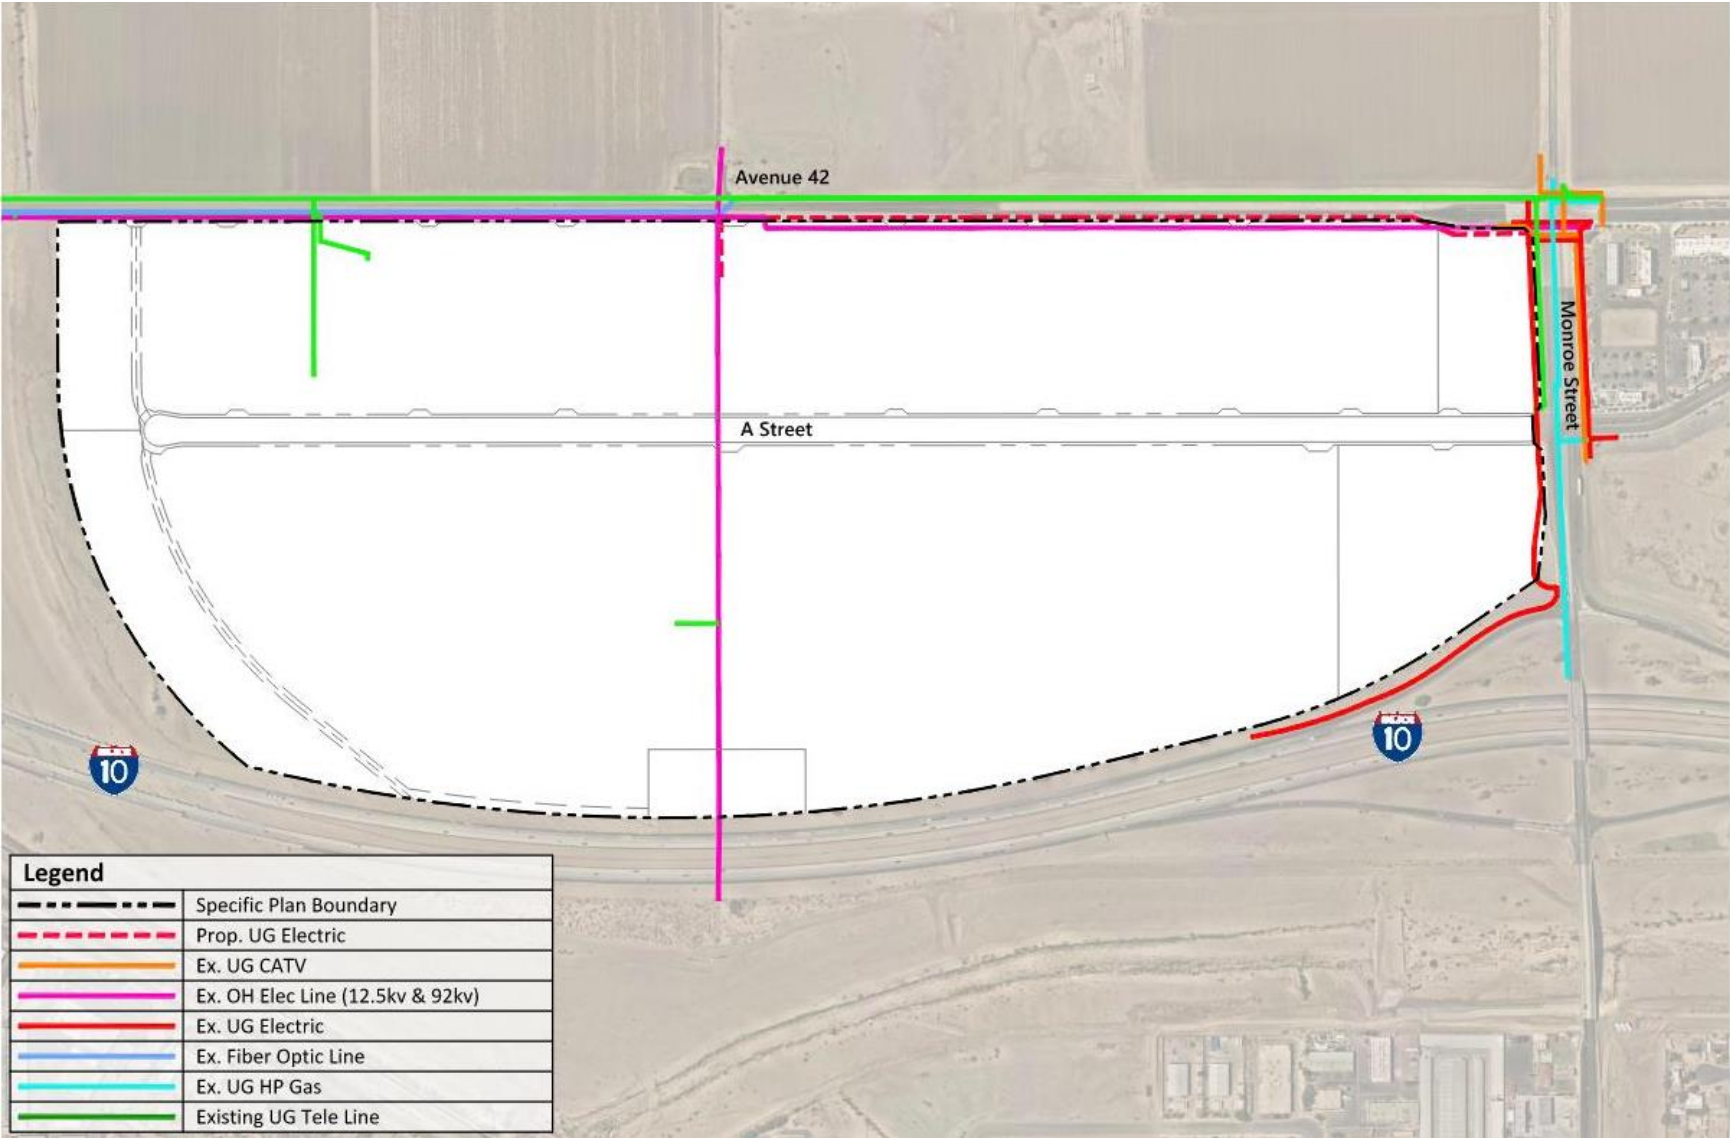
Conceptual Dry Utility Infrastructure Plan
